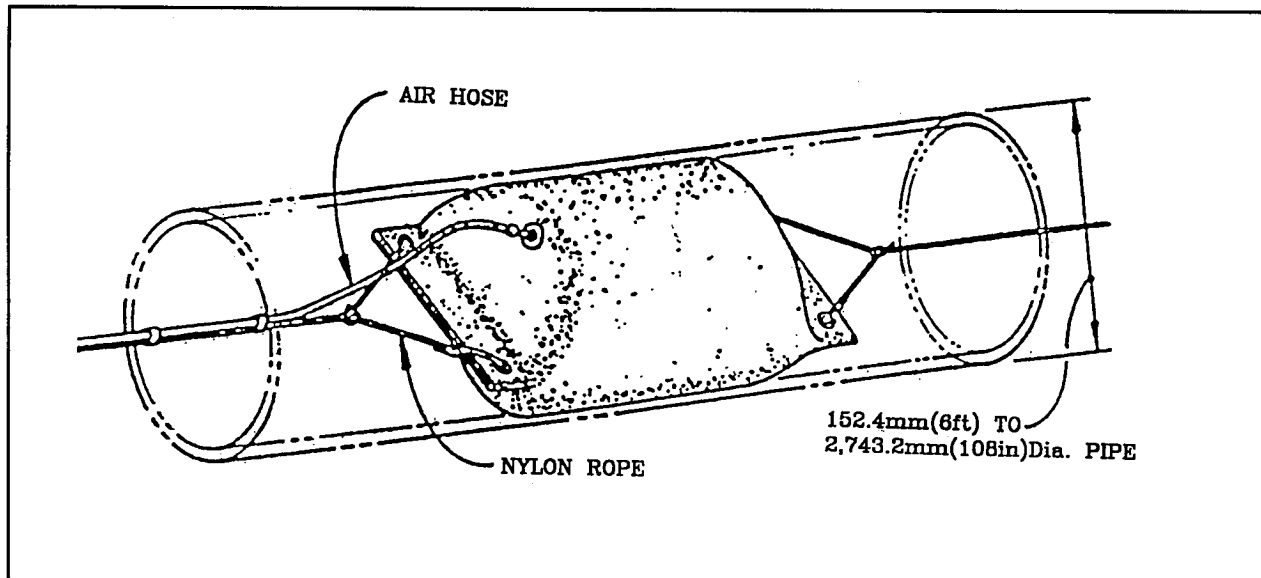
Prefabricated rubber pipe stoppers for outlet opening of a manhole
